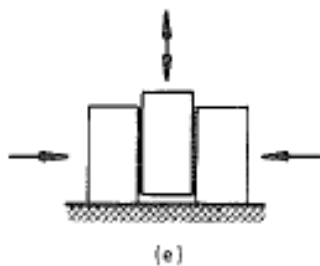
Triplet Test Specimen (Atkinson, et al. 1989)
